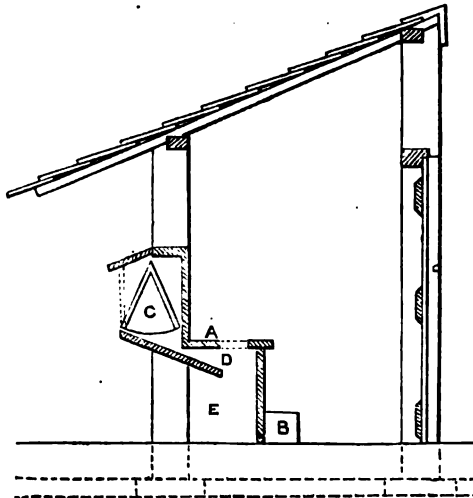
Section of Closet with External Distributor attached.—A, seat ; B, step ; C, cinder sifter ; D, ashes shoot ; E, space for moveable receptacle.
